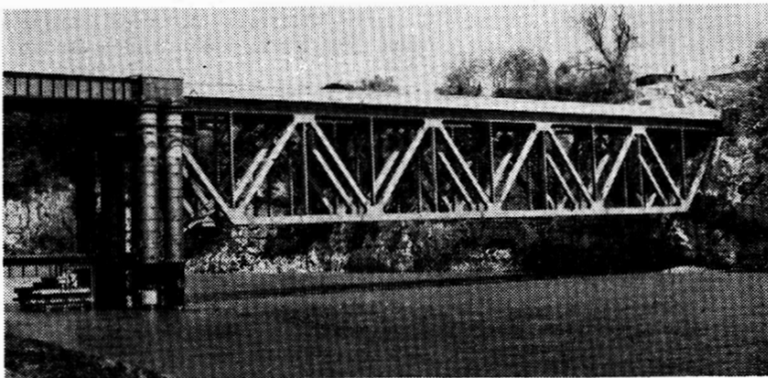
THE TWIN TRUSSES OF THE RAILWAY BRIDGE AT CHEPSTOW
